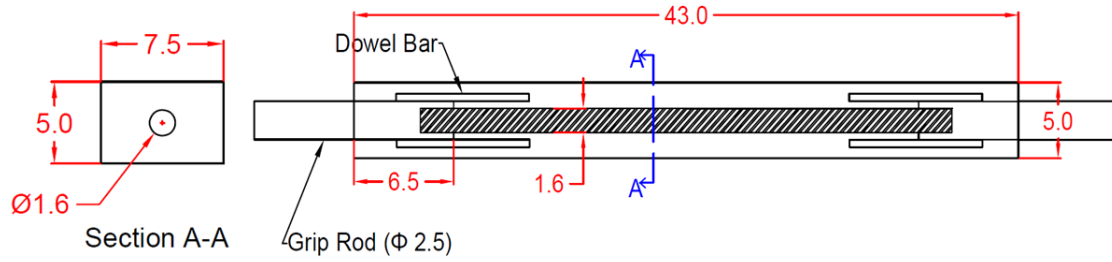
4: Tension Stiffening Specimen drawing (in cm)
